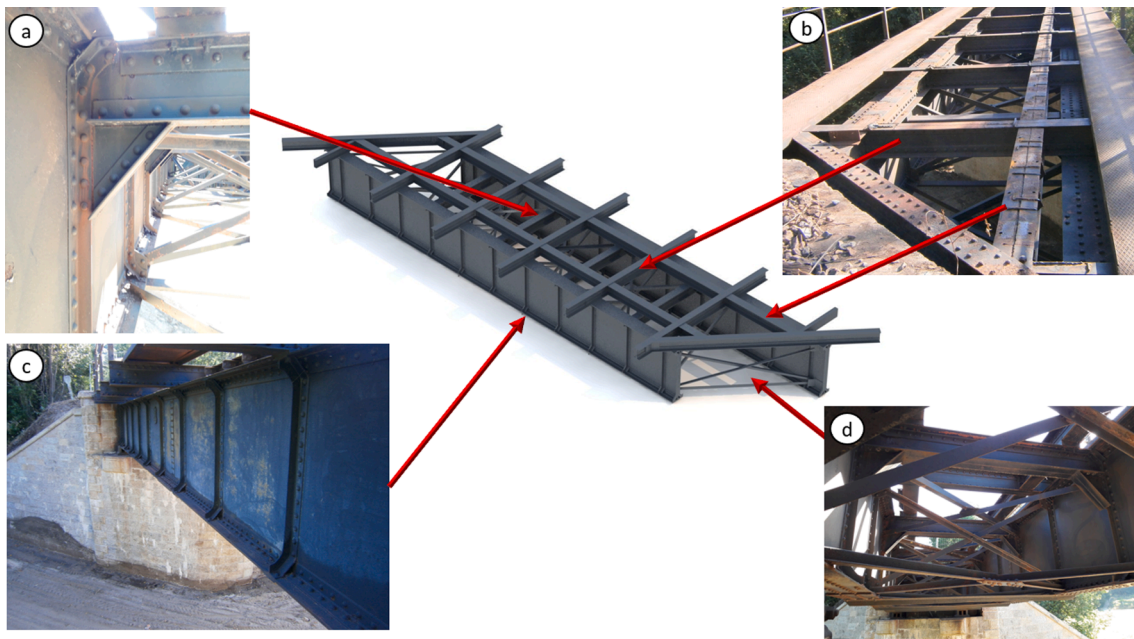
Details of main elements of the bridge: a) Cross-girder b) Upper frame c) Main girder and web stiffeners d) L-shaped bracings.
